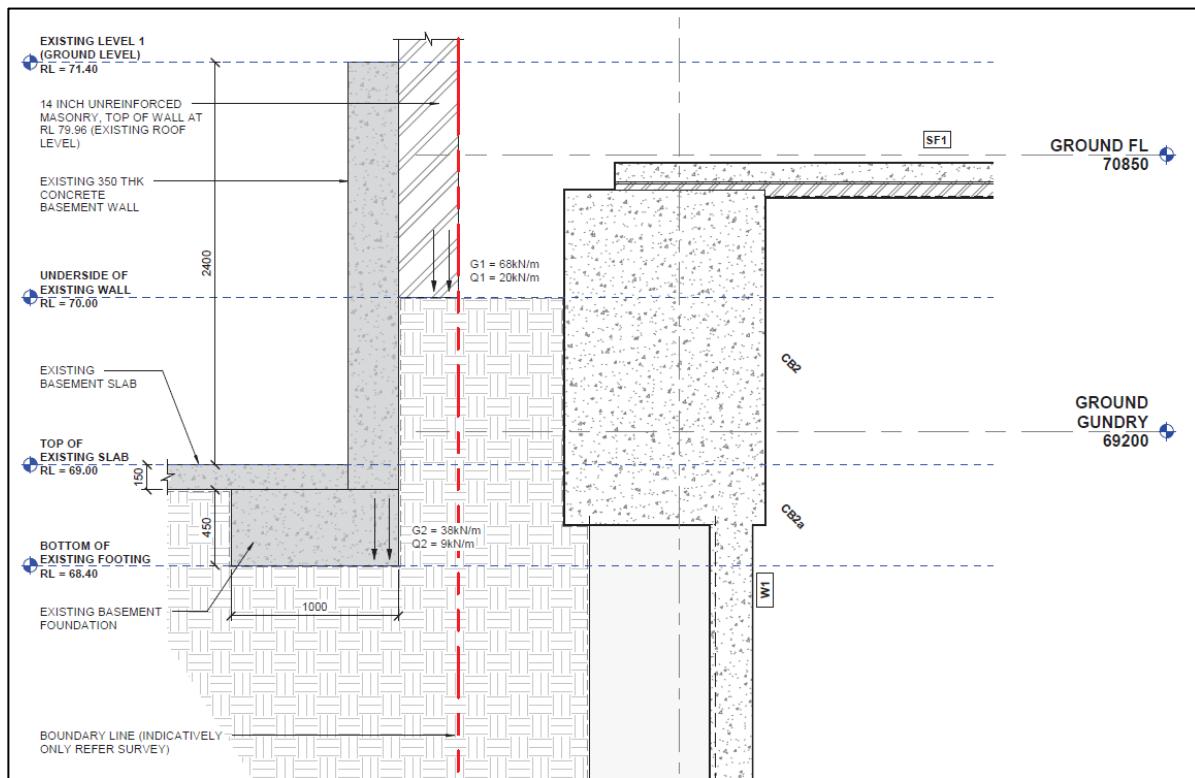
582 Karangahape Road Western Boundary Cross Section (Source: Sheet S312, Enovate Consultants)
